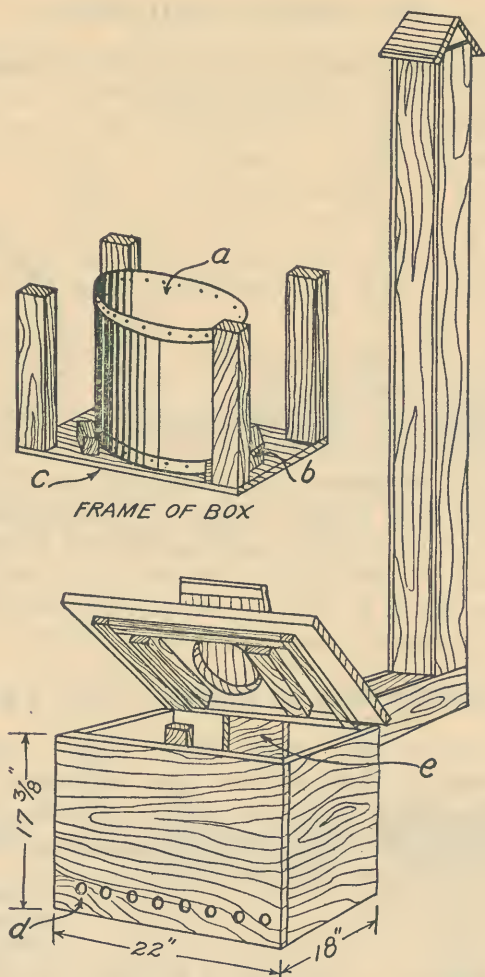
Sketch showing sanitary privy box with stack. (a) Galvanized pail, 15 inches high and 15 inches in diameter; (b) blocks to hold pail in position; (c) bottom of box; (d) 1-inch holes, 1 inch from bottom, to be covered with screen wire; (e) opening to stack, to be covered with screen wire.
